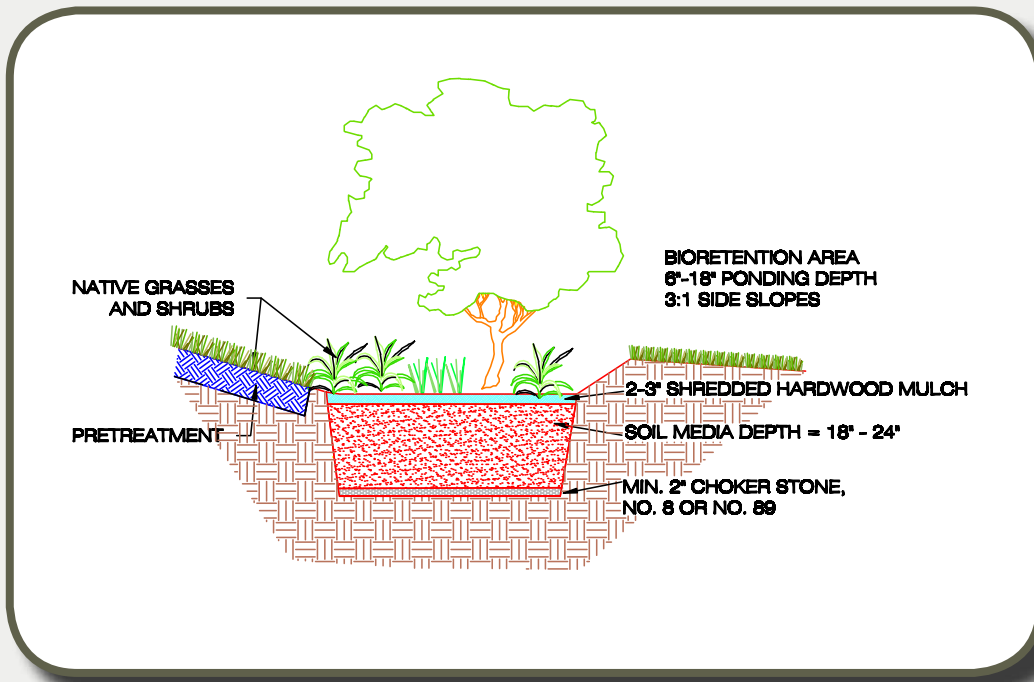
Typical Detail for Level 2 Infiltration Design (No Underdrain)
